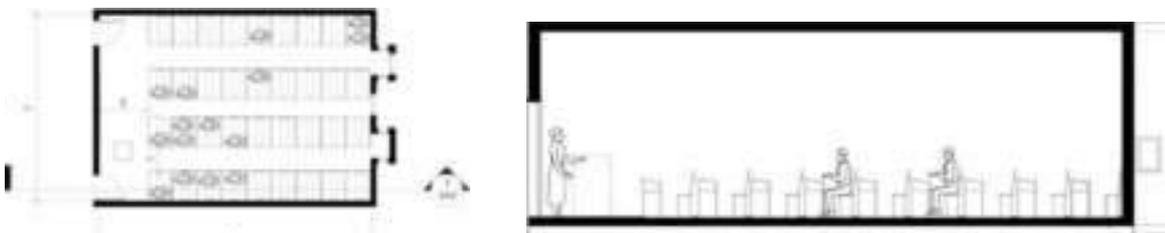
Plan and Section of Classroom Case 3 Junior college (Source:- Author)
